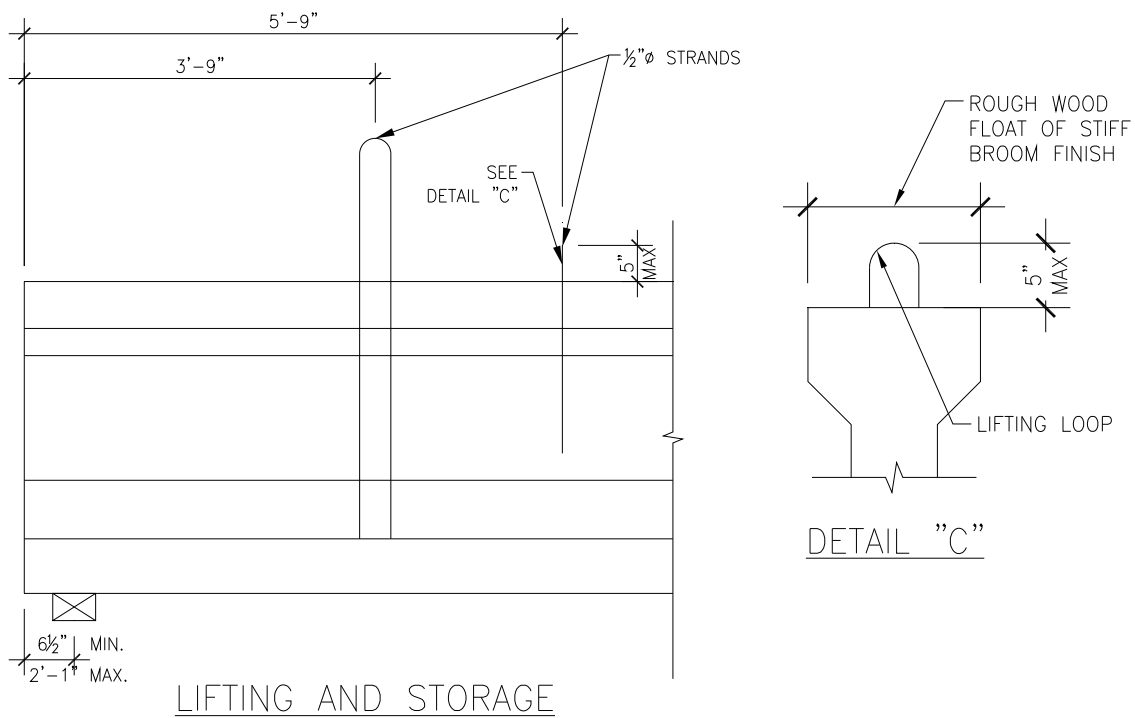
Special Lifting Loop for Specimen Handling at the Ferguson Structural Engineering Laboratory
